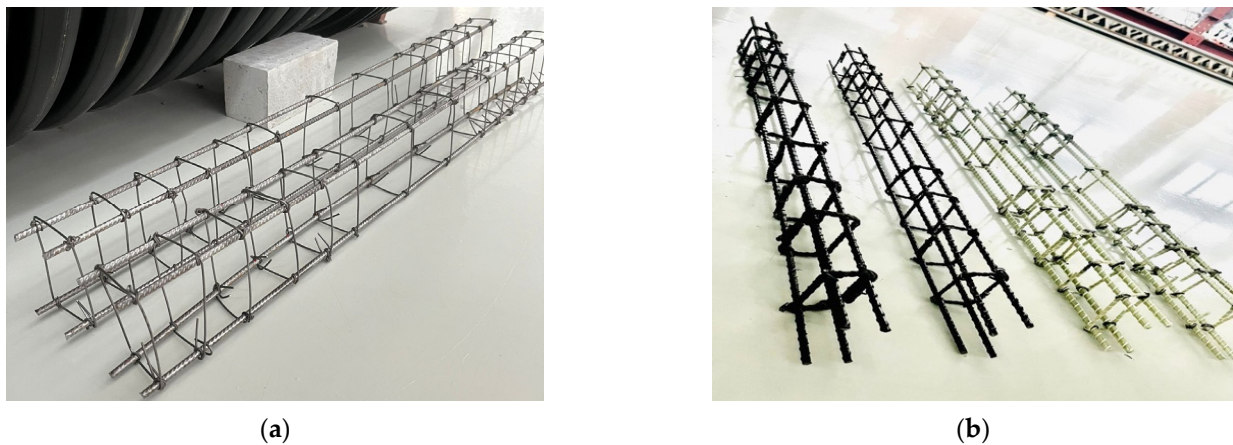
Specimens' reinforcement setup: (a) steel reinforcement; (b) FRP reinforcement.
